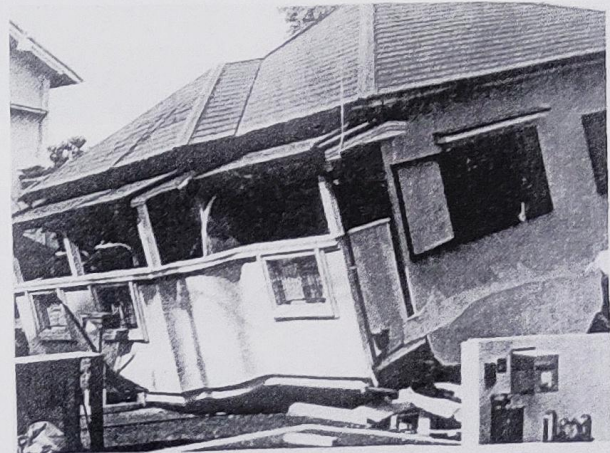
2 story apartment house building: collapse of the first piloti floor.
